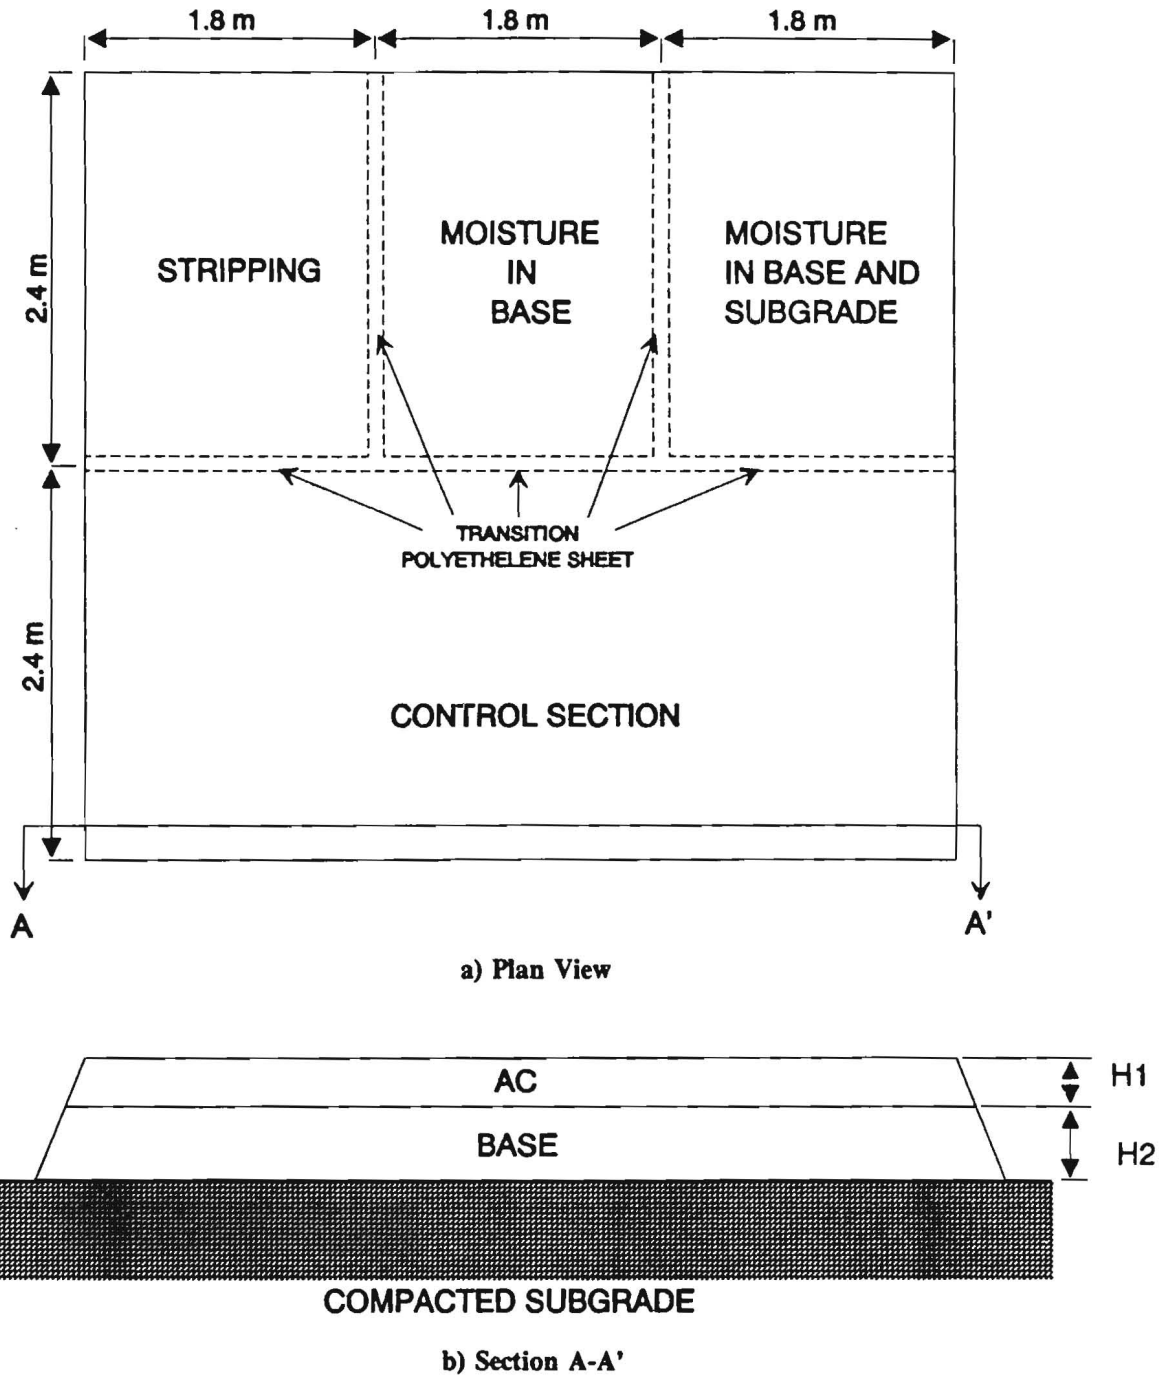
Schematic of UTEP flexible pavement test facility
